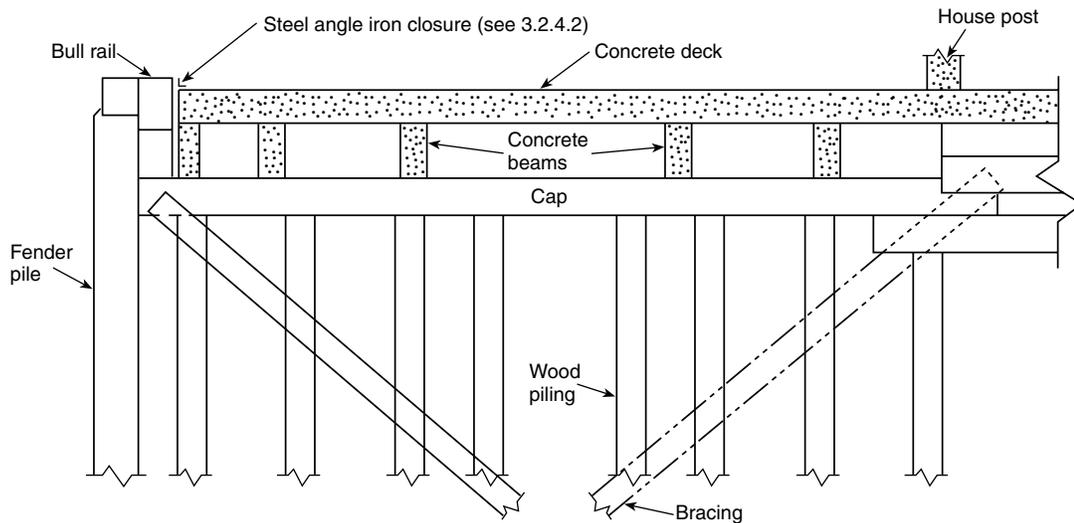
(c) Wharf substructure with fire-resistant, reinforced concrete deck and beams over combustible piles and pile caps.
